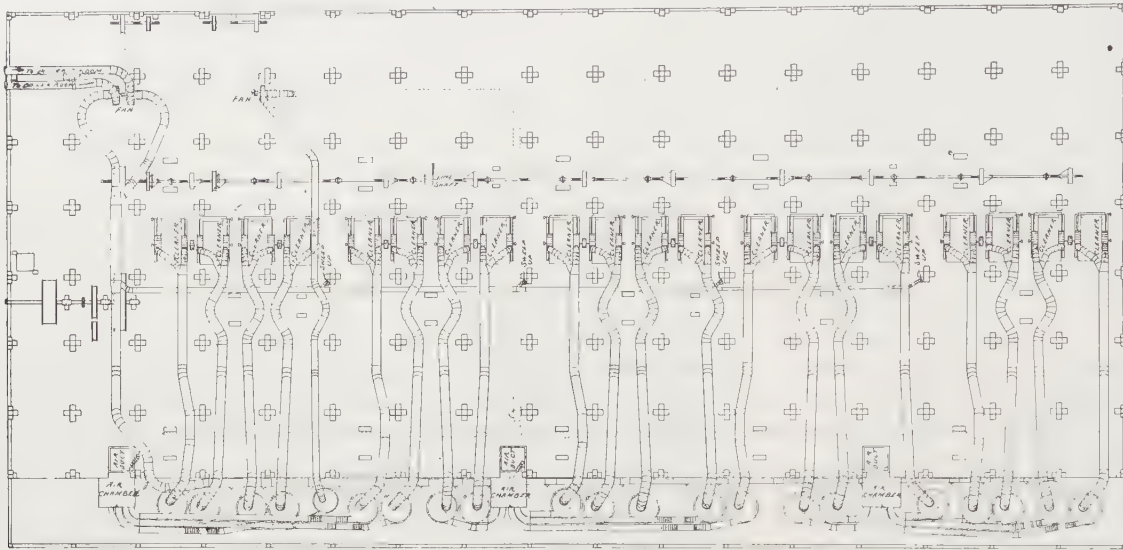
Plan of First Floor and Dust Collector Gallery.
